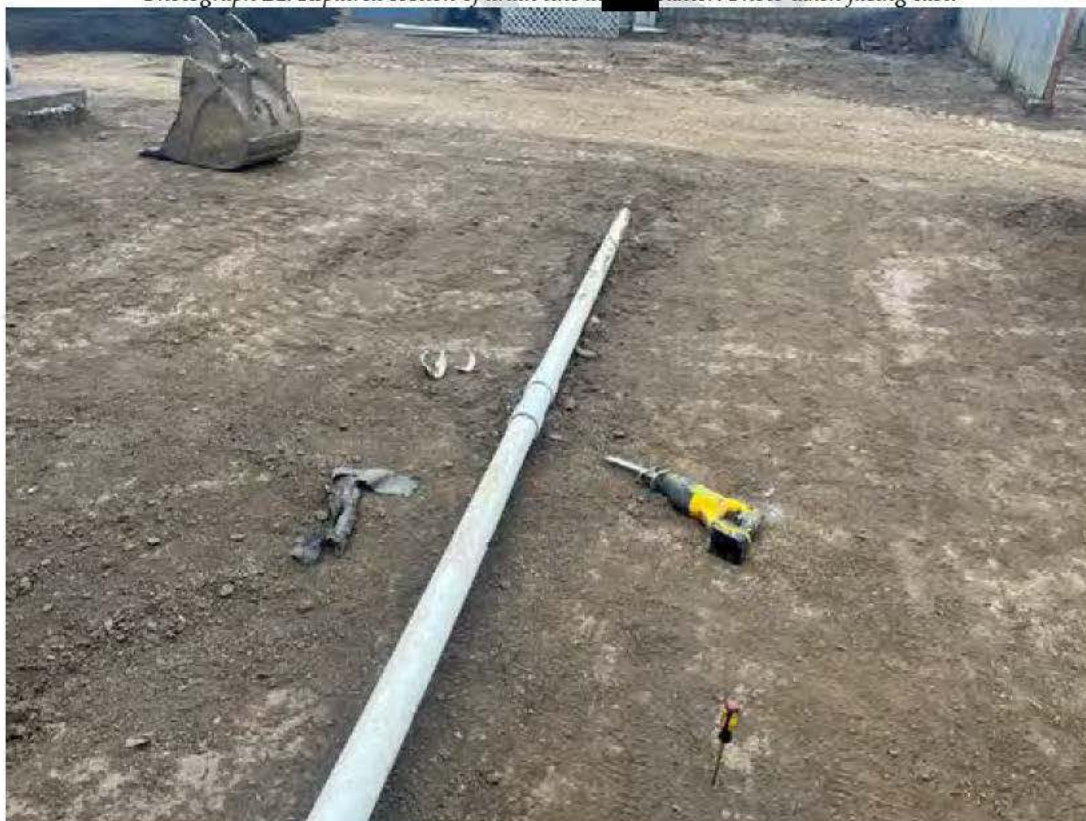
Manual excavation depth field truthing at [REDACTED] Baxter. Photo taken facing north.
